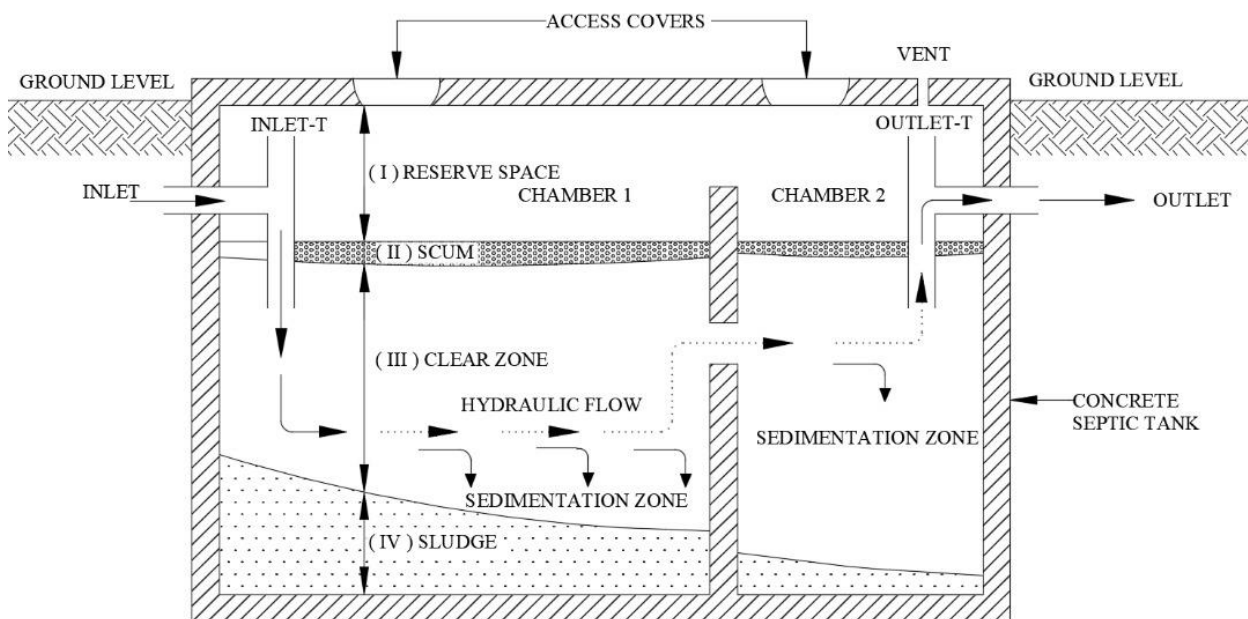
Typical underground concrete septic tank adopted in a residential household in Sibuluan, Sarawak, East Malaysia
